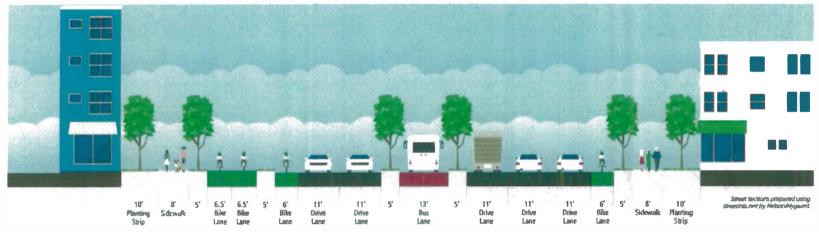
Gateway Boulevard: Potential Configuration of Shoreline Boulevard from La Avenida to Pear Avenue Looking North
